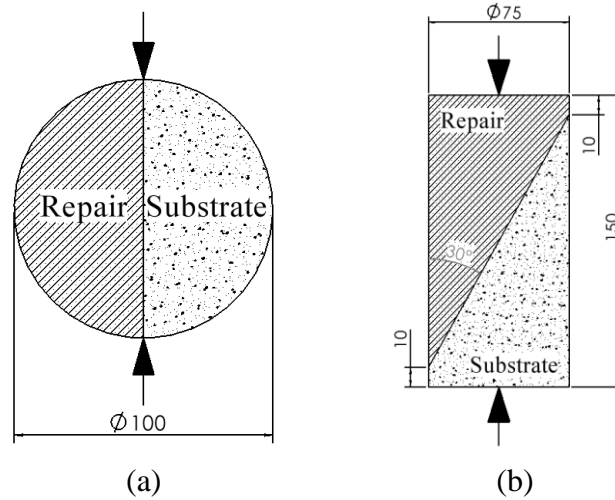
Bond test sketches (a) Splitting tensile test (b) Slant shear test (all dimensions in mm)
